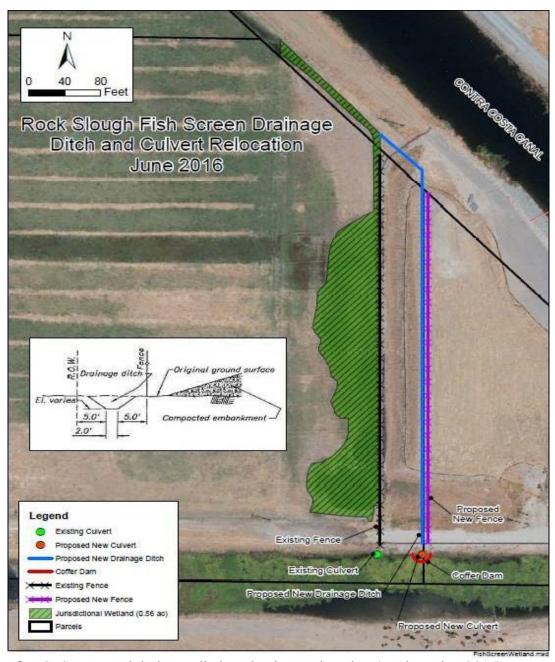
RSFS proposed drainage ditch and culvert relocation (Reclamation 2016).
